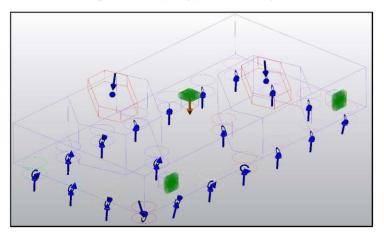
Brick Model External Loads at Foundation Cap 1ST
